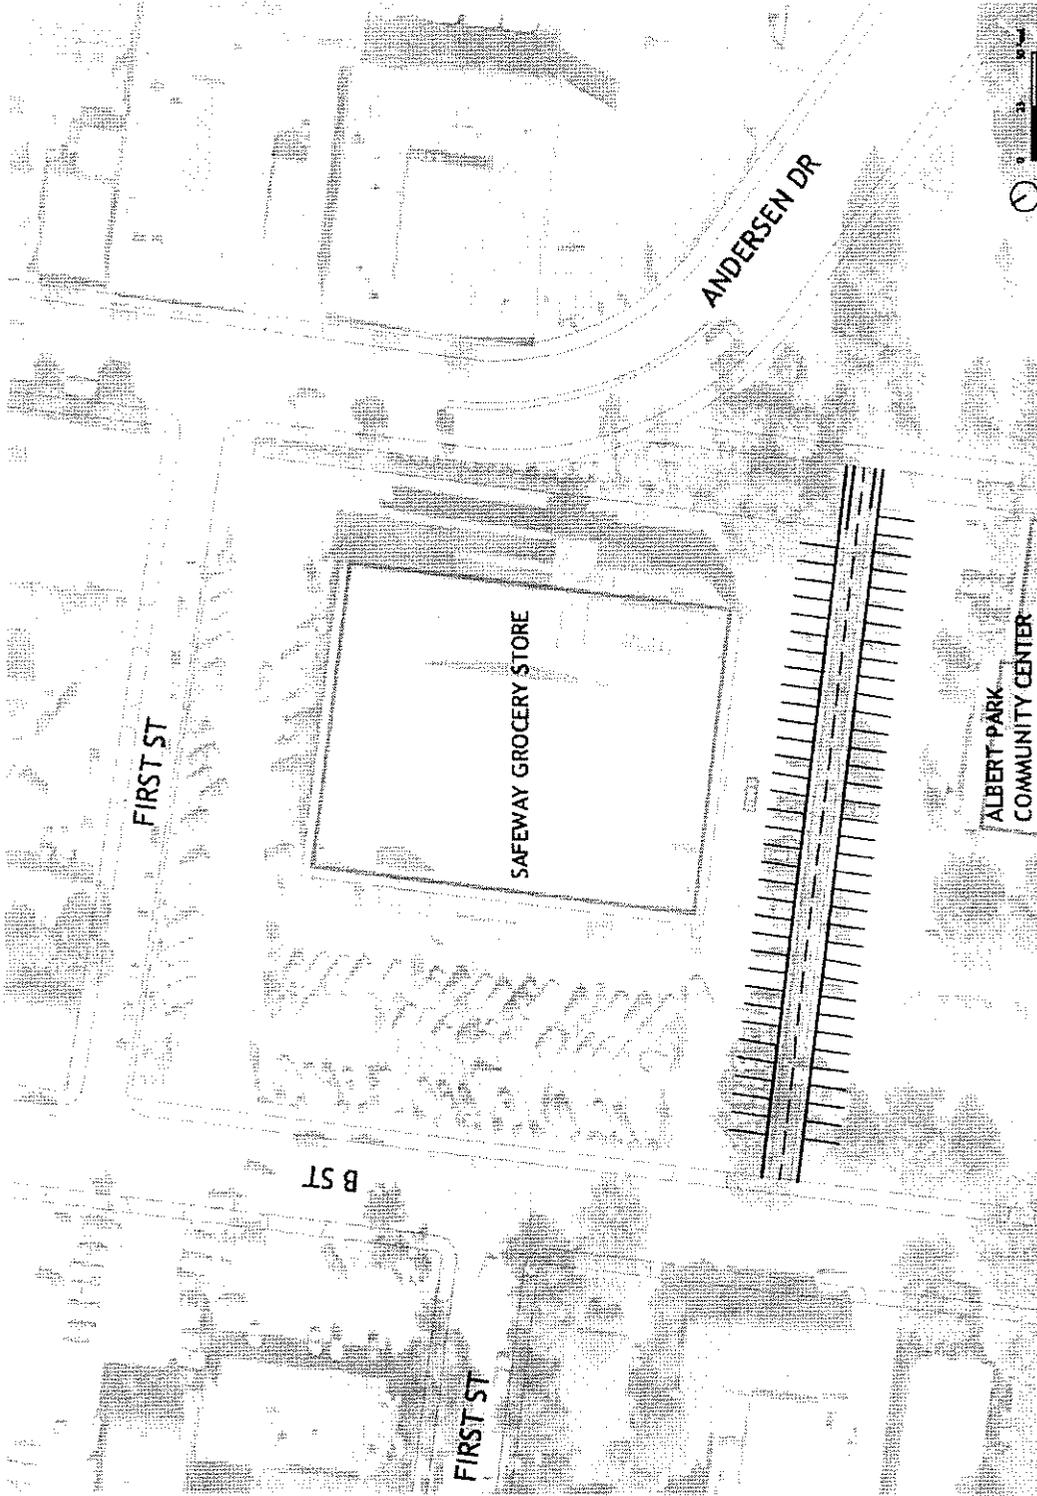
Plan View of Proposed Improvements for Project 14: First Street (B Street to Andersen Drive)
